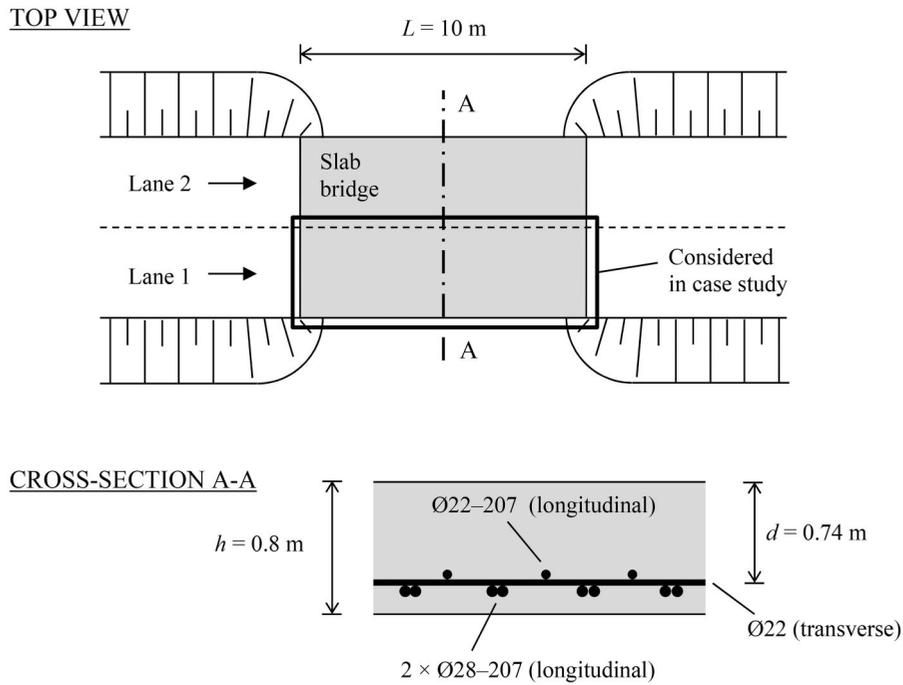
Layout of the reverse-engineered bottom reinforcement of the slab. Rebar size and spacing in mm.
